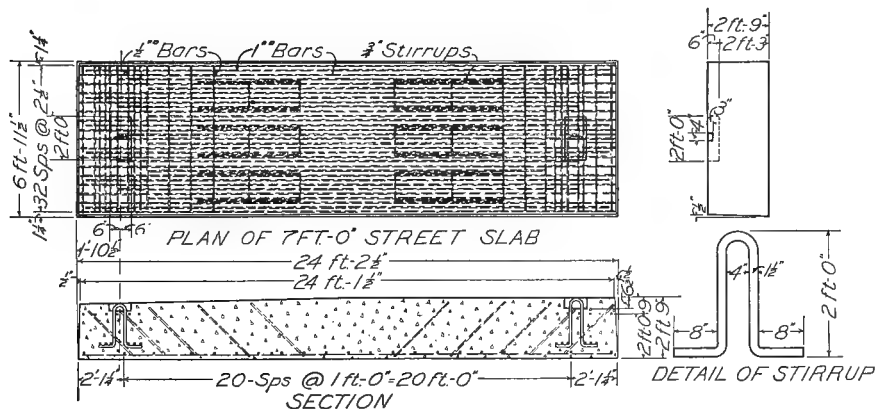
DETAILS OF TYPICAL SLAB, C., B. & Q. R. R. TRACK ELEVATION.
